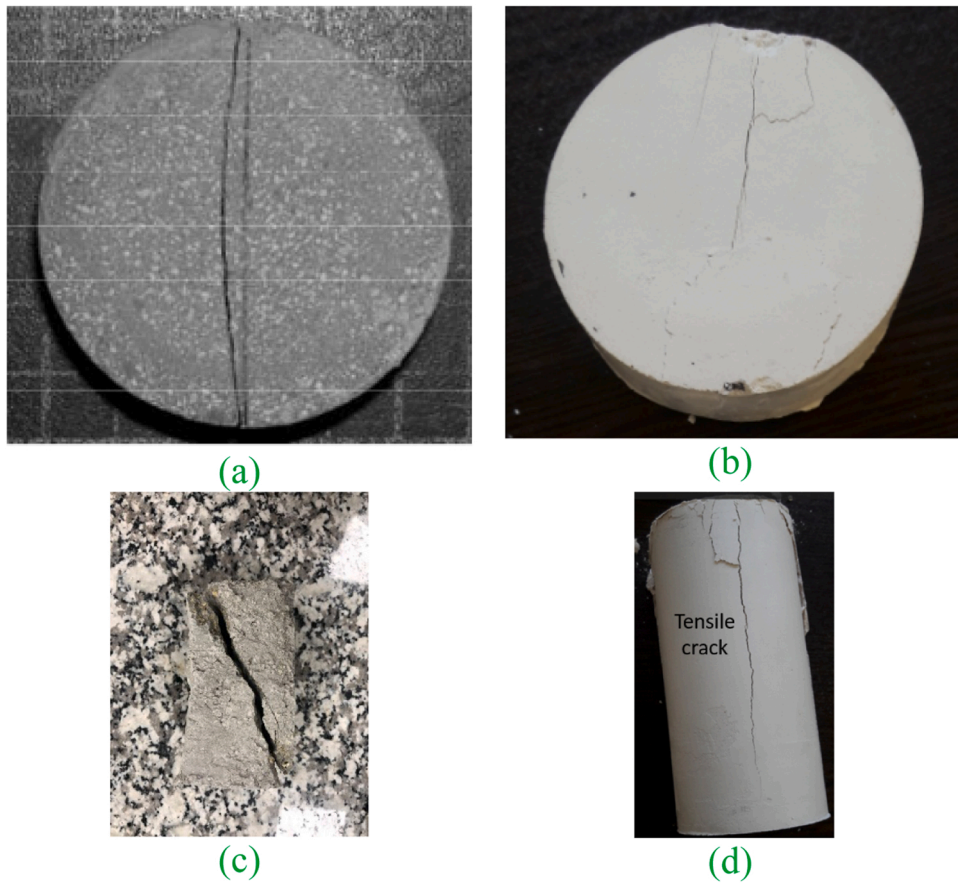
Crack growth in (a) concrete specimen, and (b) gypsum specimen subjected to Brazilian tensile strength test, and crack growth in (c) concrete specimen, and (d) gypsum specimen subjected to UCS test.
